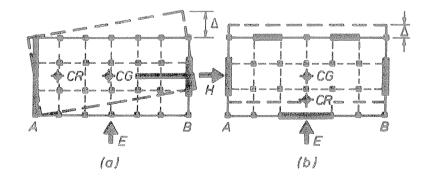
The layout of Shear Walls affects the Torsional Stability of the Lateral Load Resisting System.
